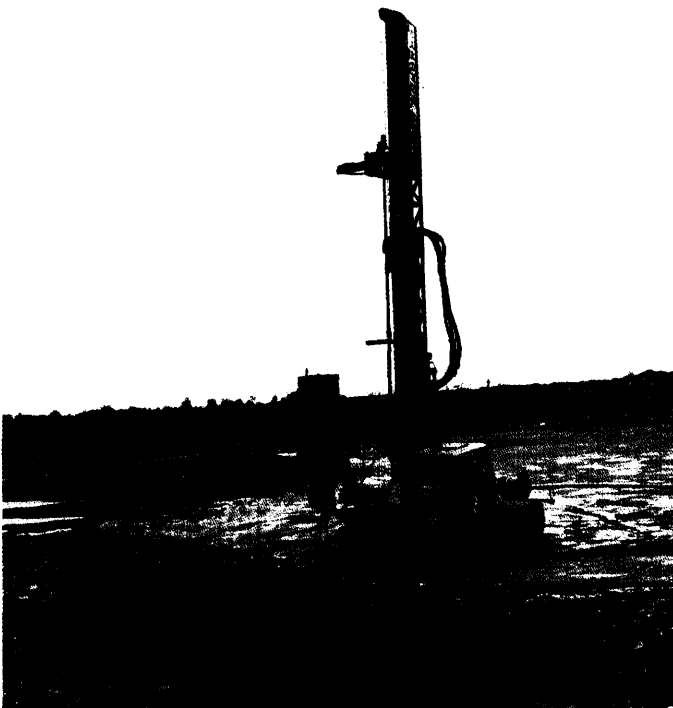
GARDNER-DENVER AIRTRACK DRILL ON 2ND LIFT OF R.E. LAW QUARRY (LOOKING SOUTH).
